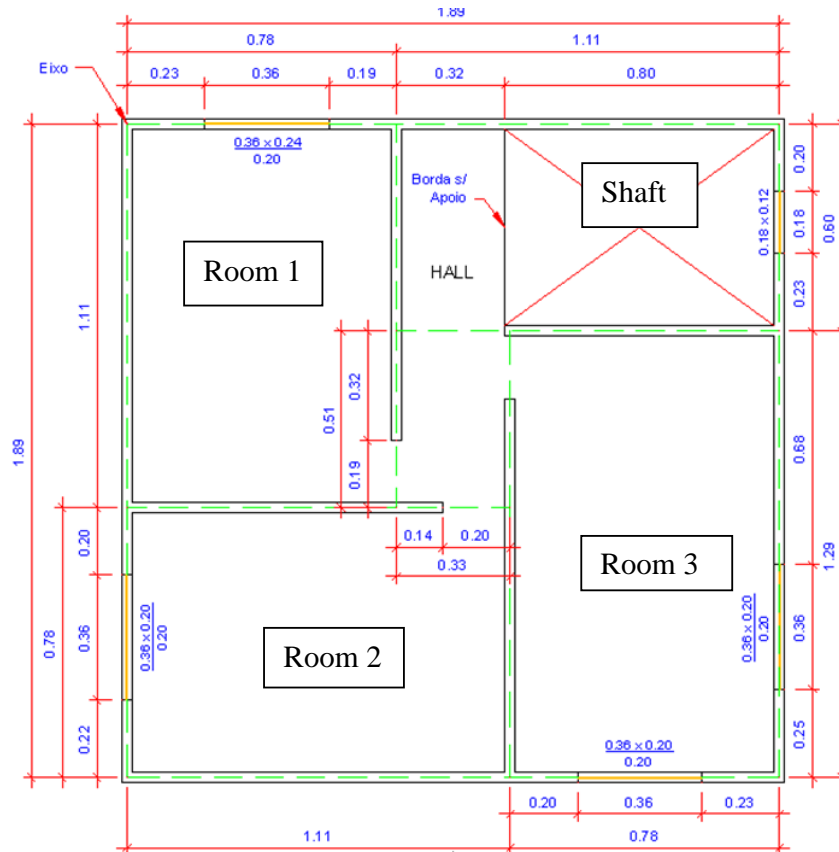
Typical floor of the small-scale (1:5) building – Dimensions in m.
